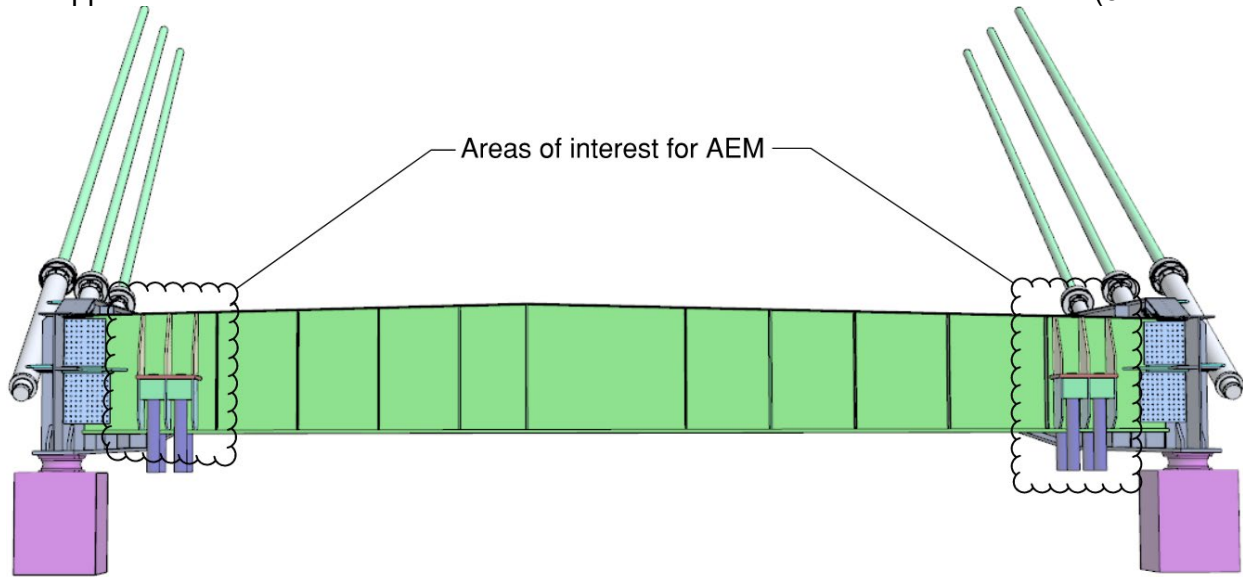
Drawing of an end floor beam with area of interest to AEM indicated
